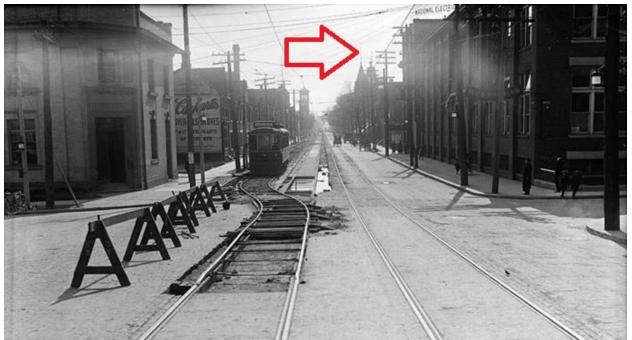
Archival photo (1917) looking west along Queen from River Street. New Method Laundry and National Electric Heating (with fourth-storey addition) buildings visible (indicated by red arrow). City of Toronto Archives, Fonds 1231, f1231_it0475.
